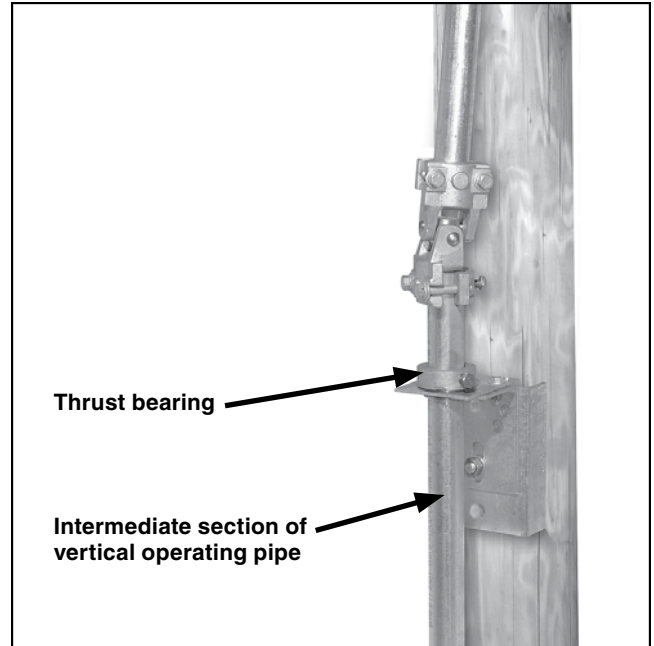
Install the intermediate section of the vertical operating pipe. Make sure the thrust bearing is resting on the guide bearing.
